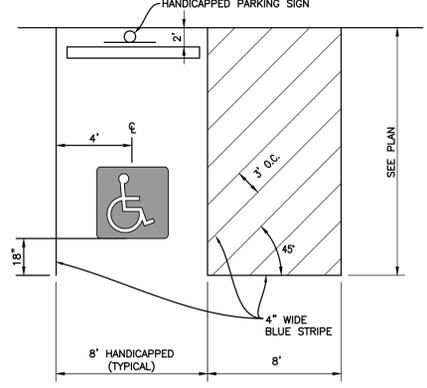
ACCESSIBLE PARKING SIGNAGE
